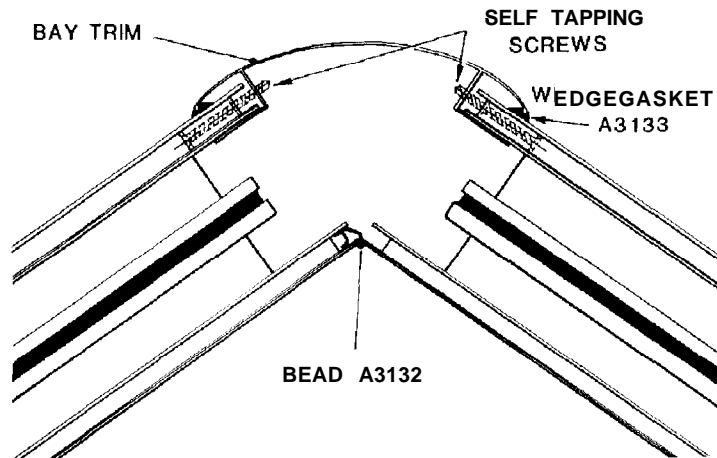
FIXING THE TRIM TO THE FRAME
